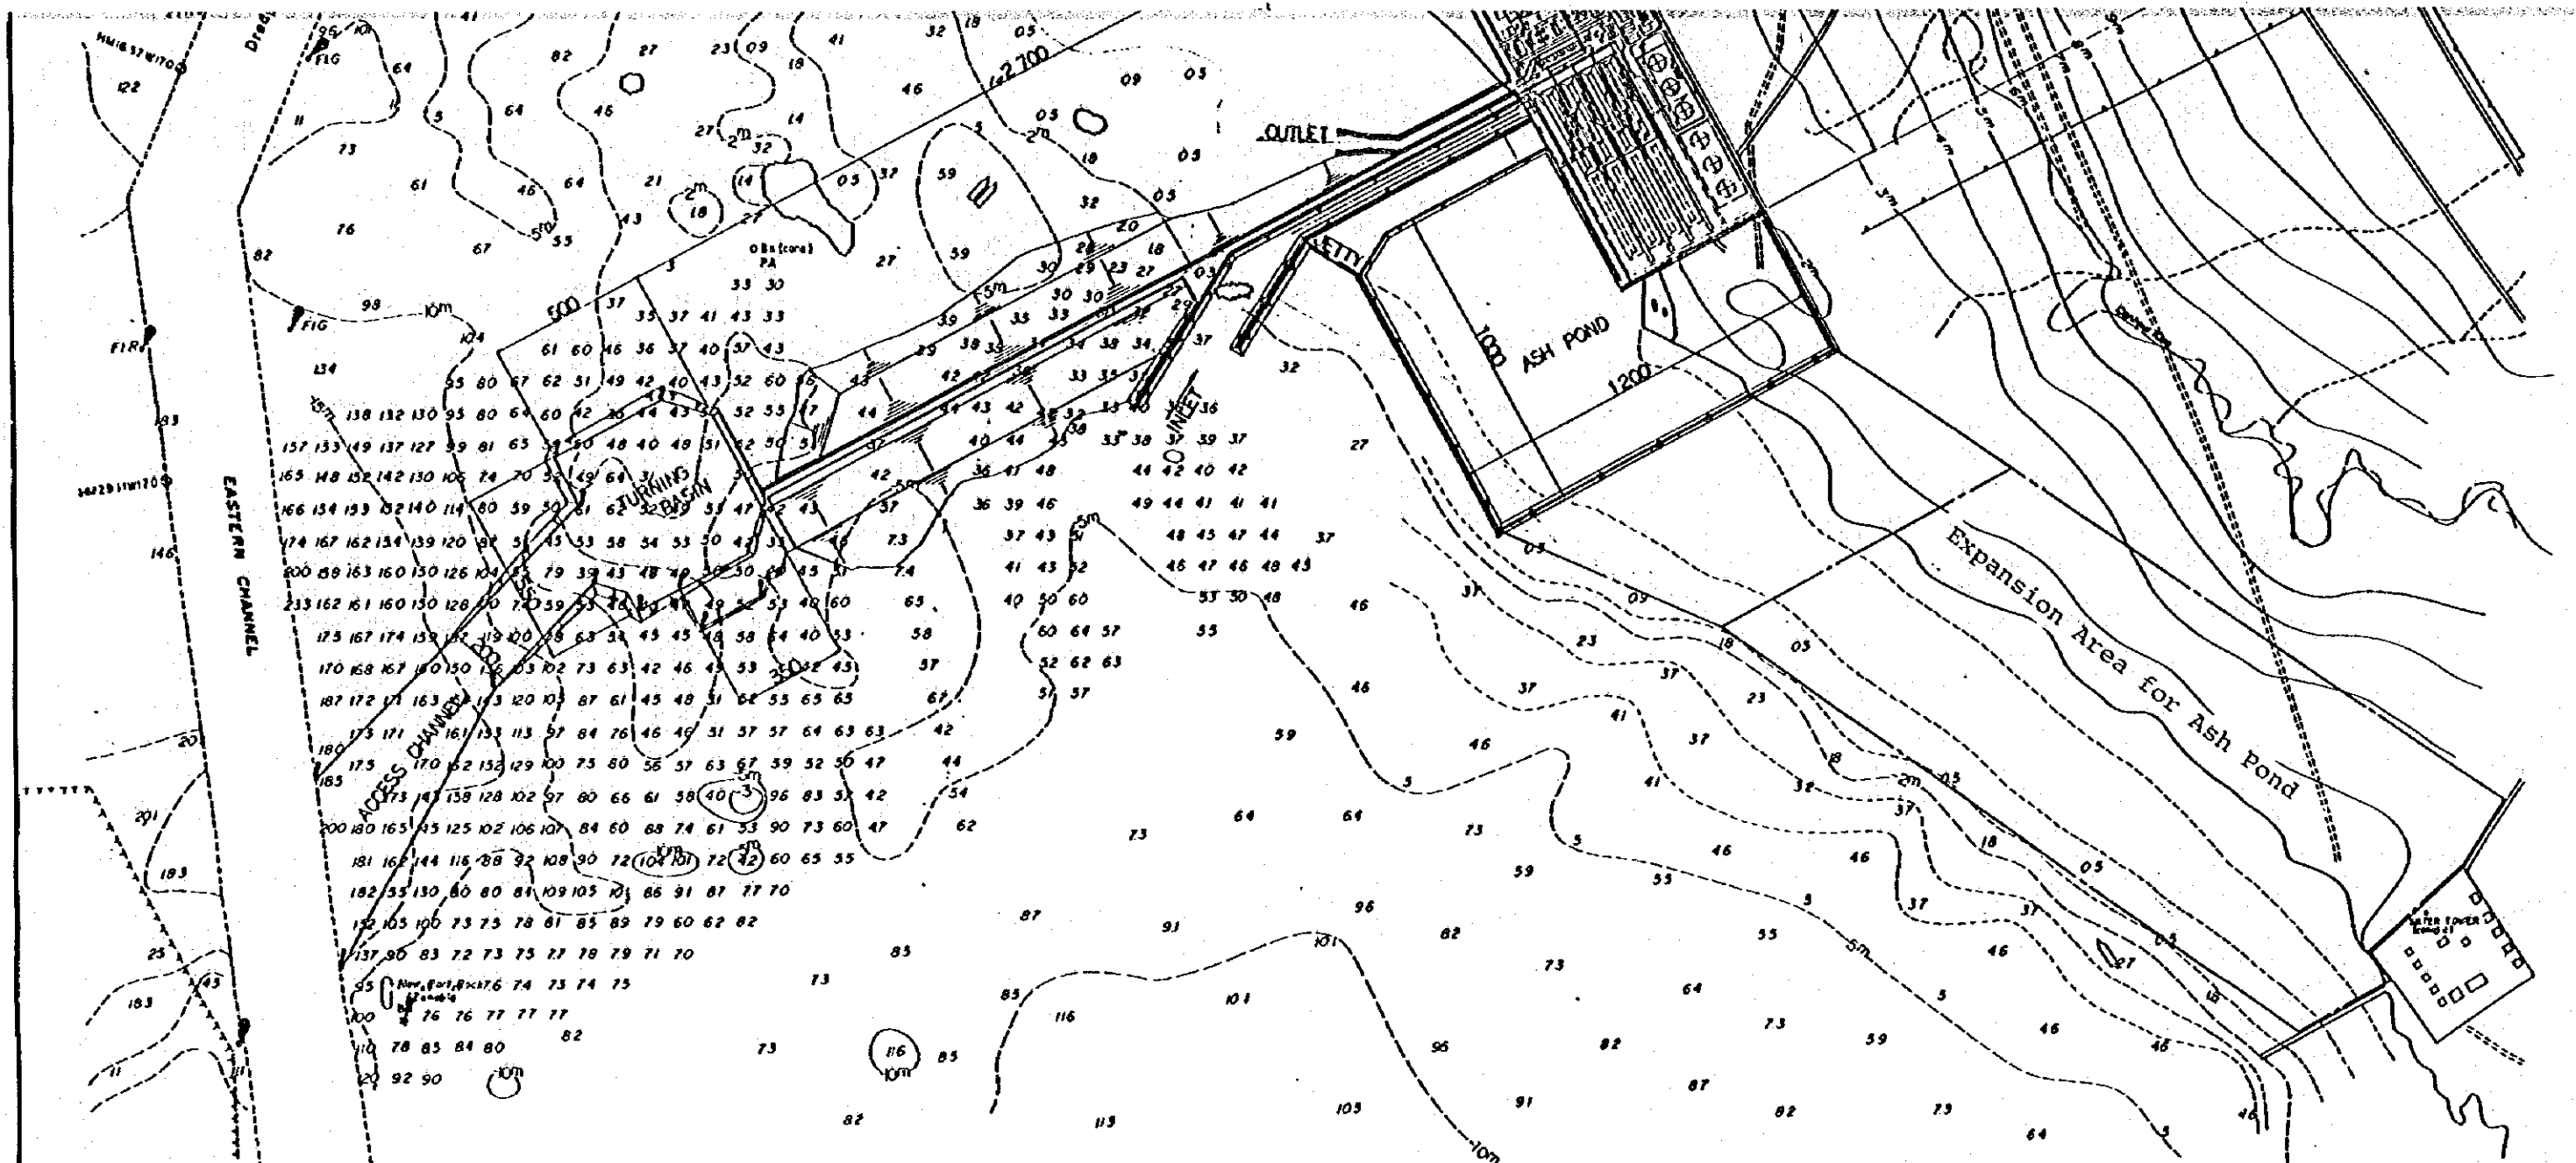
General Layout of Sinai Coal-Fired Thermal Power Project (North Ayun Musa Site)
